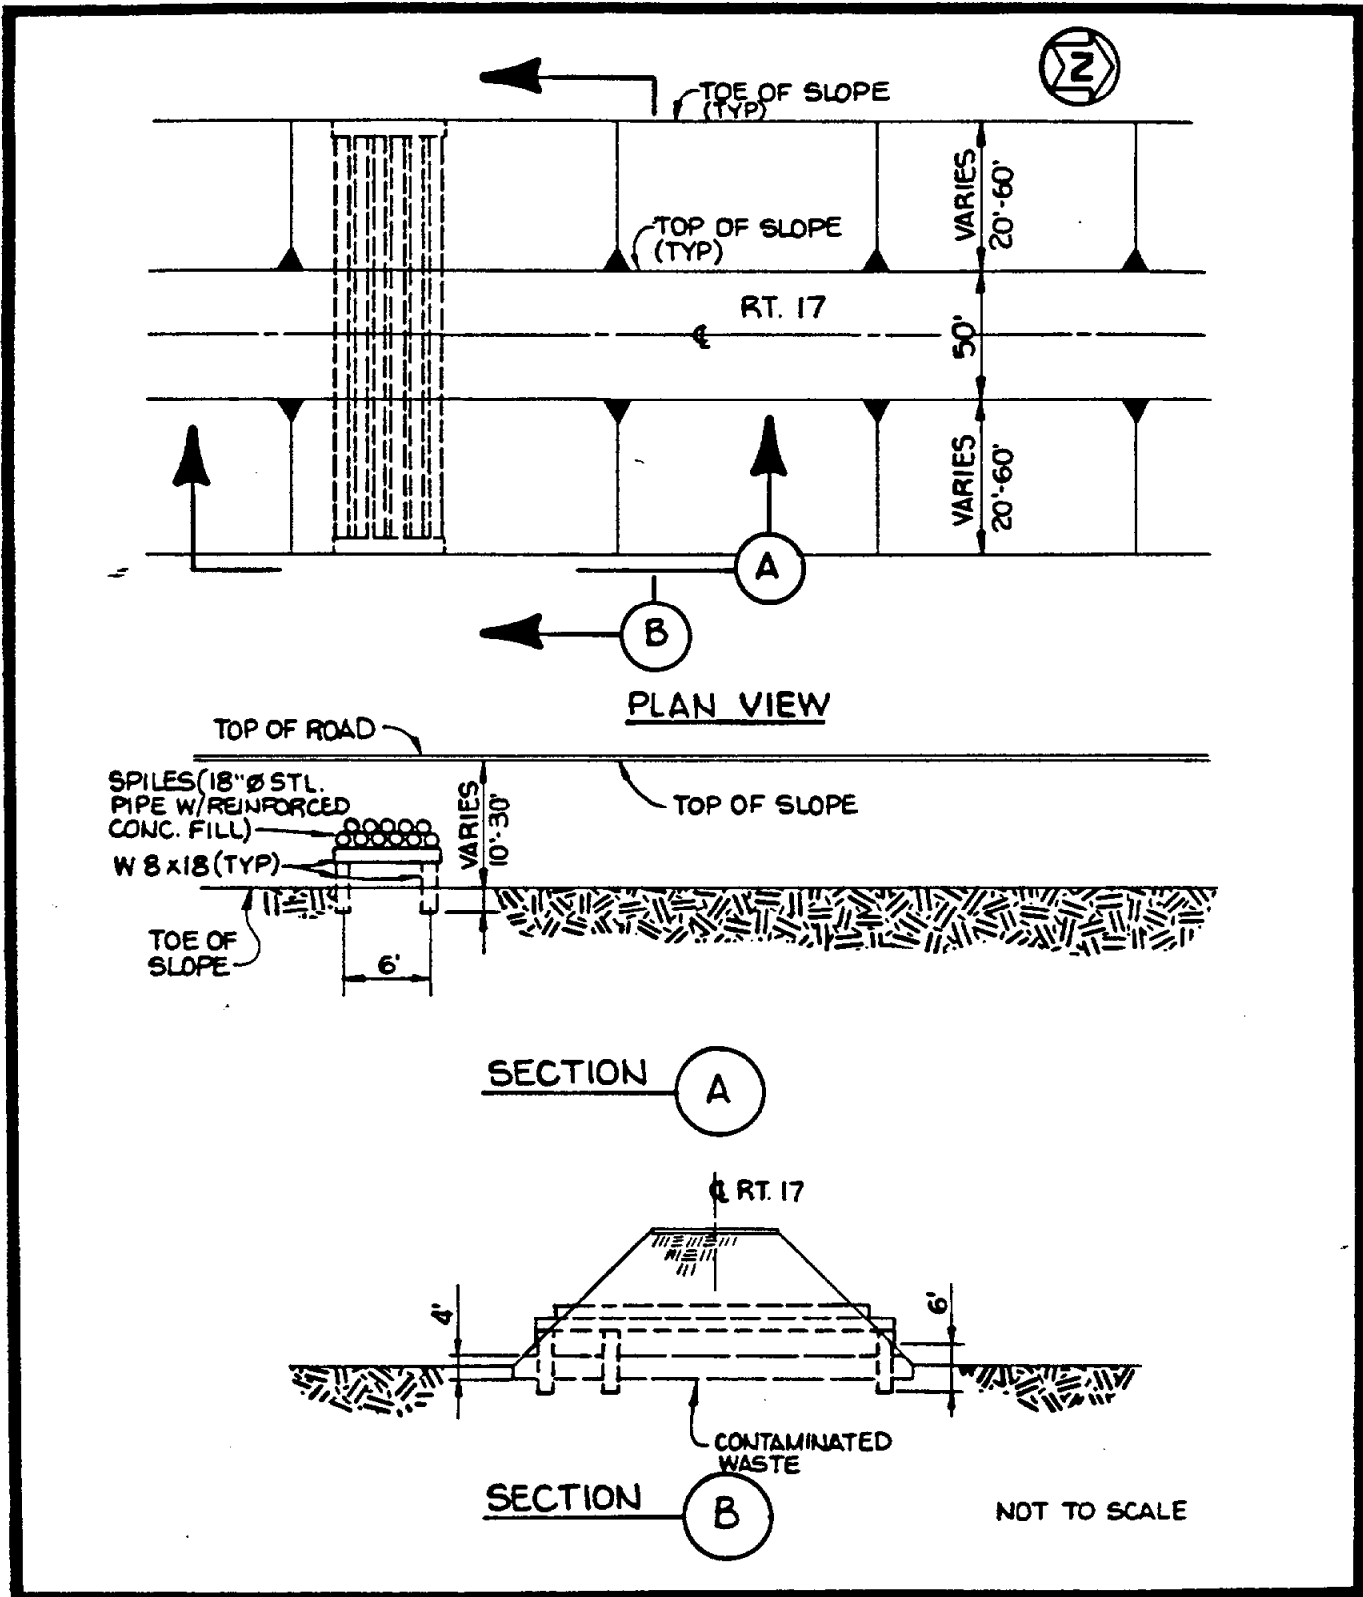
REMOVAL OF RADIOACTIVE CONTAMINATION UNDER ROUTE 17 USING BASIC TUNNELING METHODS
